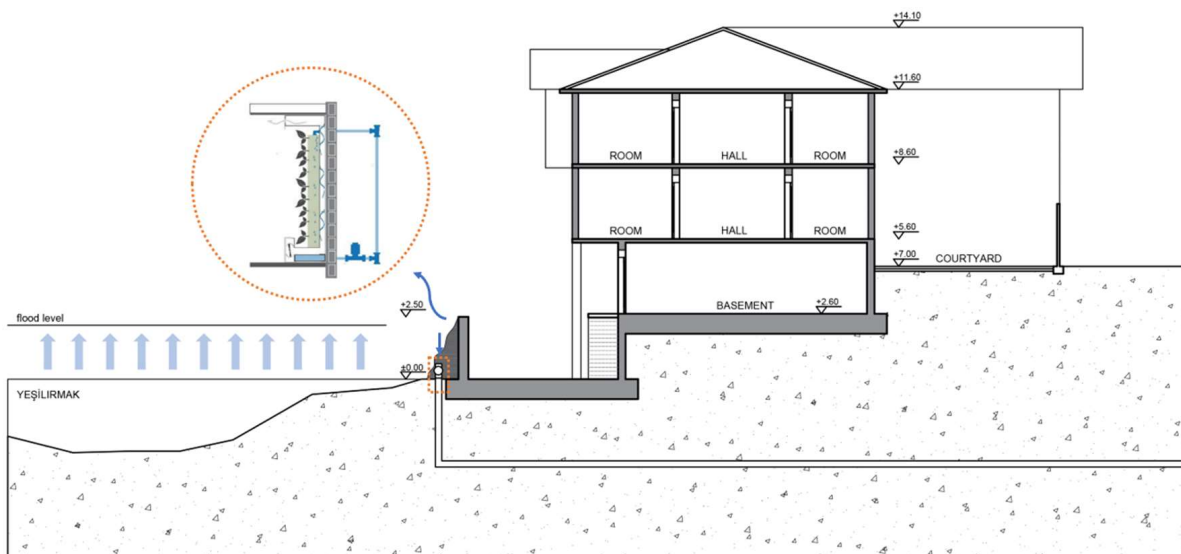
Green wall design and evacuation drainage (Drawn by the authors)
